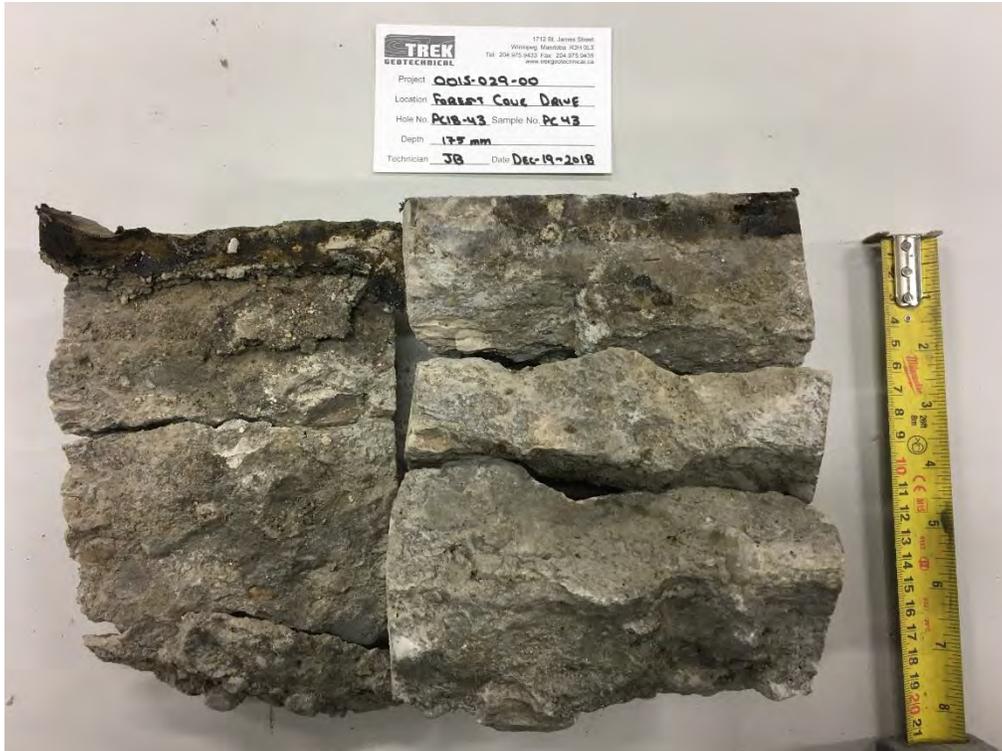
Pavement Core Sample view of Joint at Test Hole PC18-43
